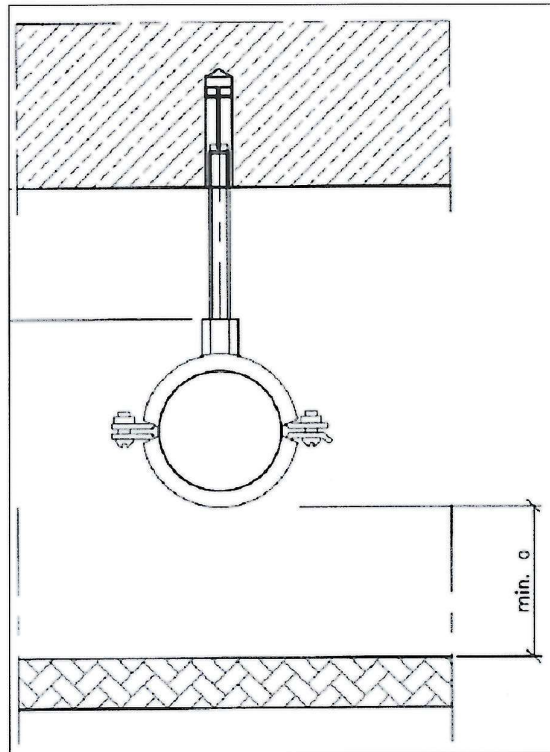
Exemplary view of the installation of Würth ventilation pipe clamps in areas between ceilings where the suspended ceiling is of relevance for fire protection
